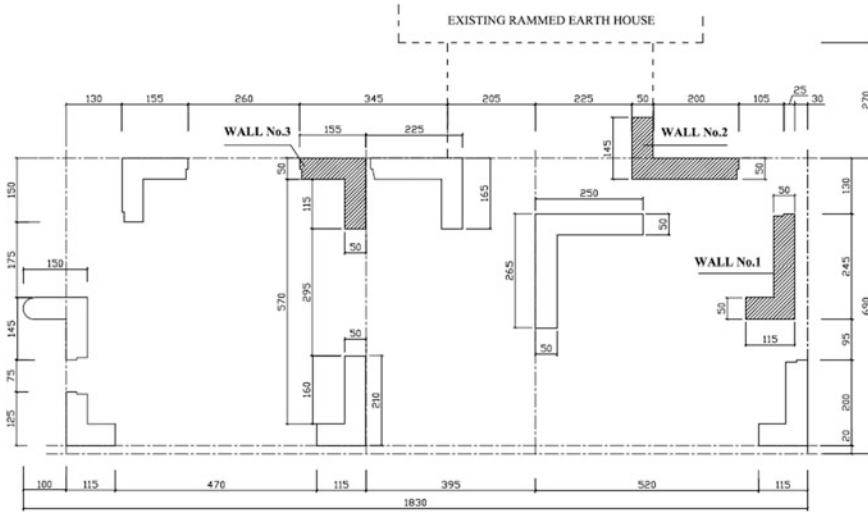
Plan of the RE house studied (dimensions are in cm)
